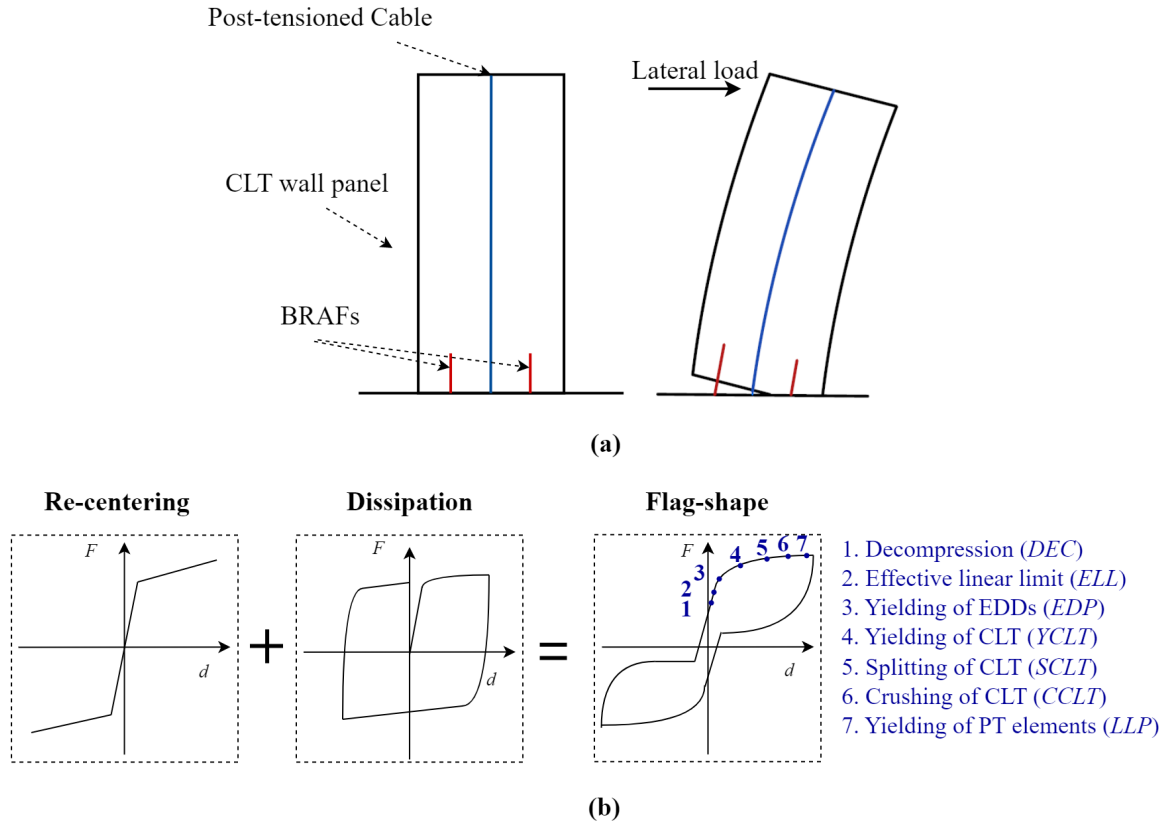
(a) PT-CLT single wall with BRAFs under lateral loading. (b) Idealized flag-shaped force-deformation hysteresis of PT-CLT walls with BRAFs.
